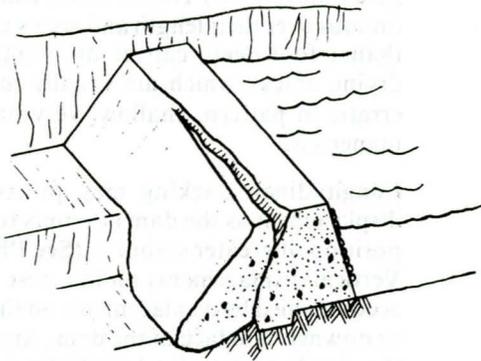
SEVERE LONGITUDINAL CRACKING. Cracking pattern indicates horizontal movement between adjacent sections of the dam. Note the close parallel cracks.
